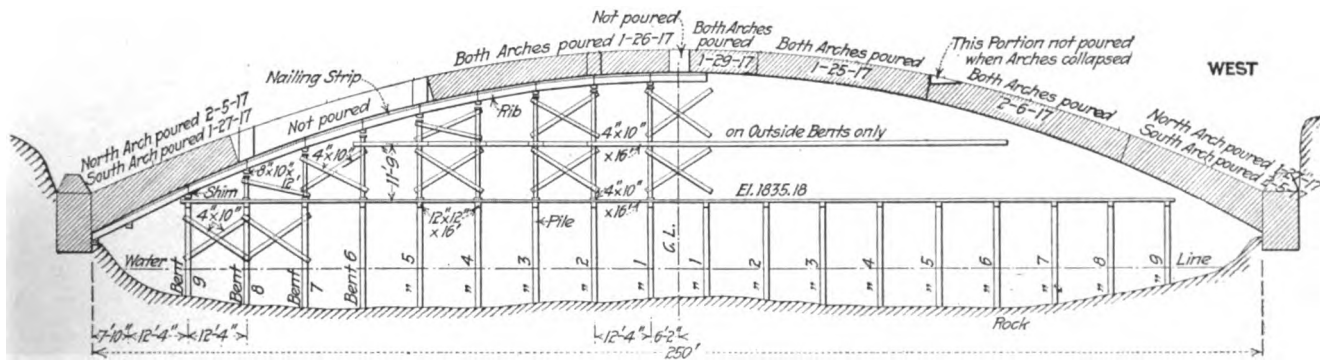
OUTLINE OF POST ST. BRIDGE FALSEWORK, SHOWING PROGRESS OF PLACING CONCRETE
